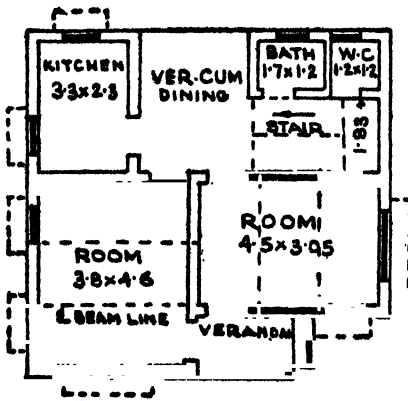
TWO ROOMED (COMPACT PLAN) WITH PROVISION FOR STAFF CASE FOR LOW-INCOME GROUP (L.I.G.)
